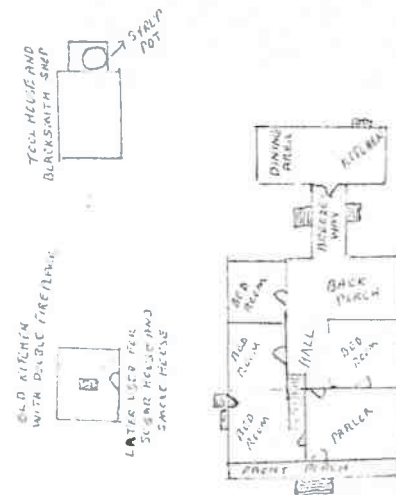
Plan of Gould House, c. 1900, based on recollections of H. C. Gould, Jr., 1969.
